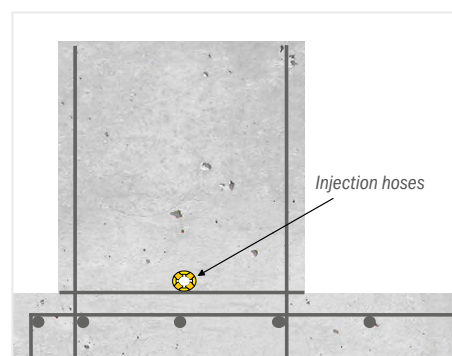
Injection hose in the working joint between base plate and wall (example) [7]
